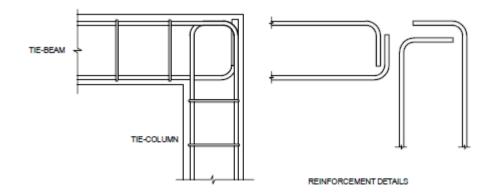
ANCHORAGE OF TIE-COLUMN AND TIE-BEAM LONGITUDINAL REINFORCEMENT
